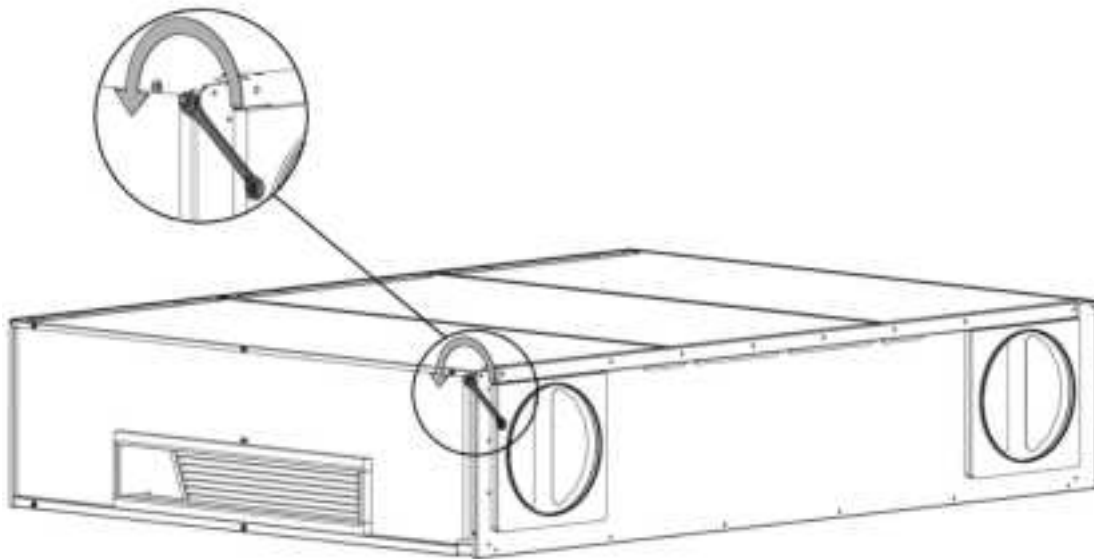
Disassemble the rear bracket, left-hand side seen from behind
